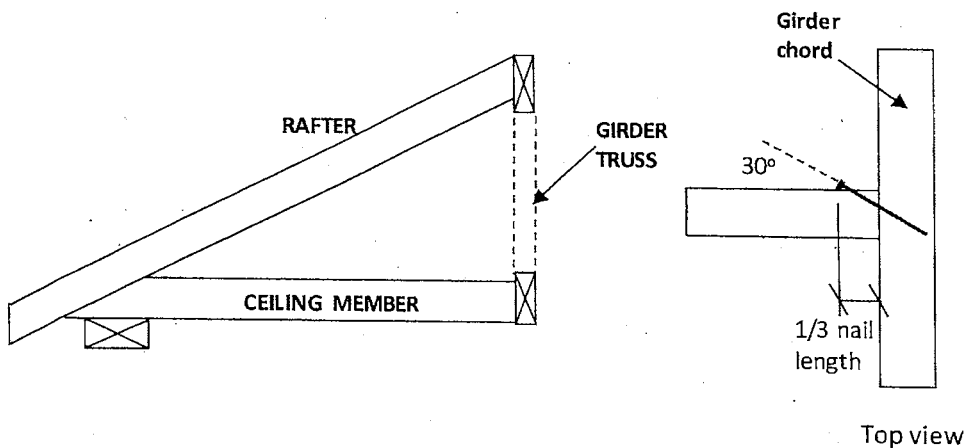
Toe-Nailing Rafter / Ceiling Member to Girder Truss
